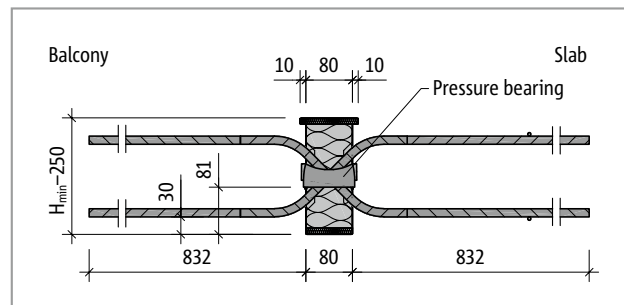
Schöck Isokorb® T type Q-VV12: Product section
